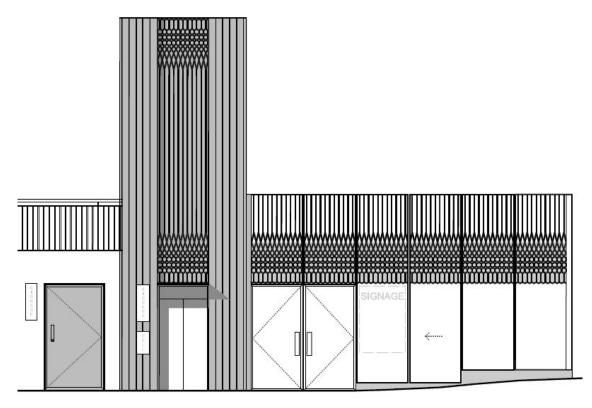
West elevation of Building H, showing the entrances for the public WC, lift and retail/café unit (from left to right) on Lower Stable Street
